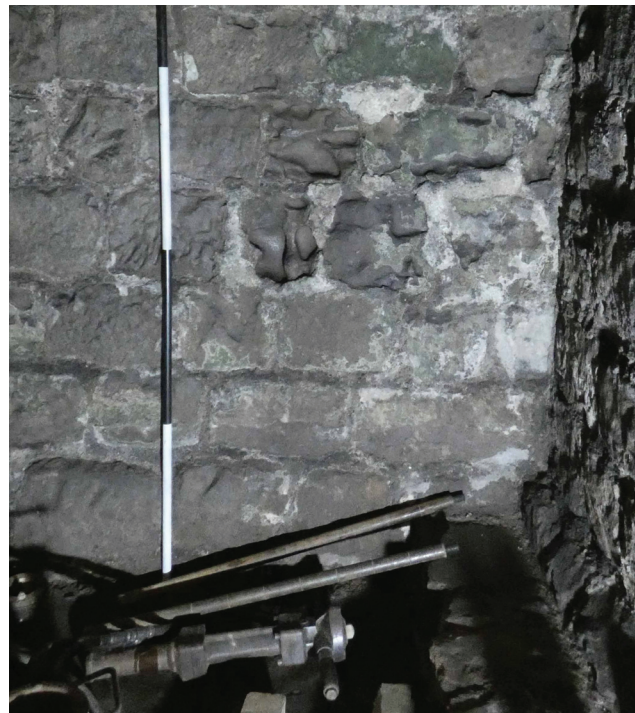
'Licking stones' in the south-east elevation of the dungeon/storeroom
